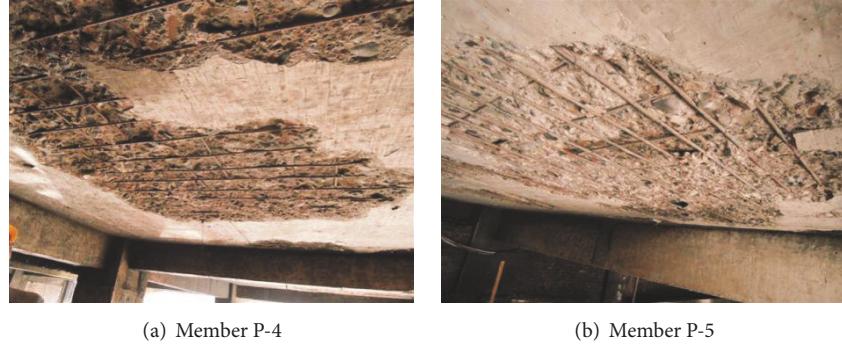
Concrete of the plate bottom cracked, loosened, and exfoliated, and rebar exposed.
